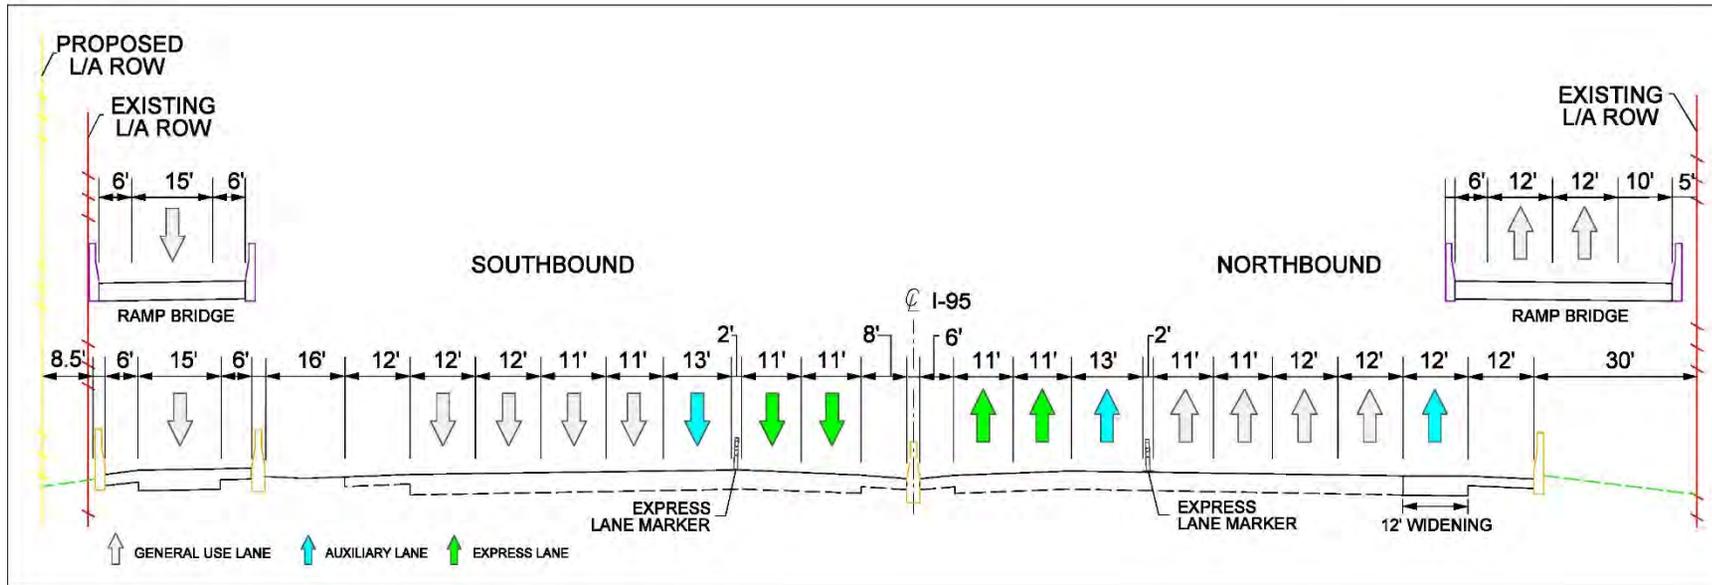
I-95 Alternative 2 Roadway Section North of Hallandale Beach Boulevard
